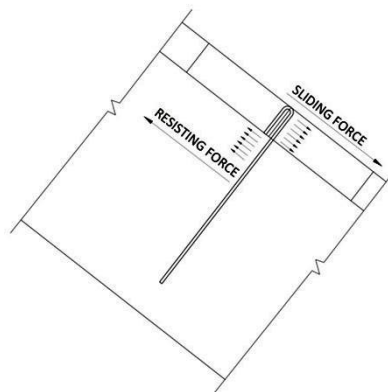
Net sliding force acting laterally on the anchor stake
